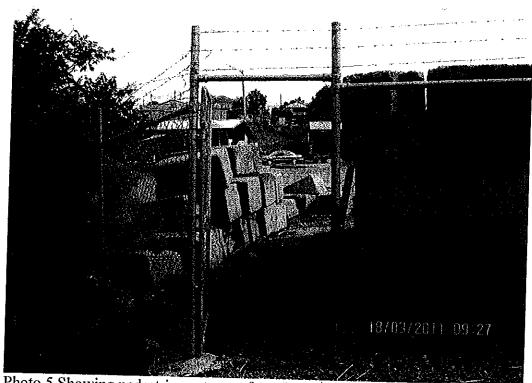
Showing pedestrian entrance from Iron Street to the site.
